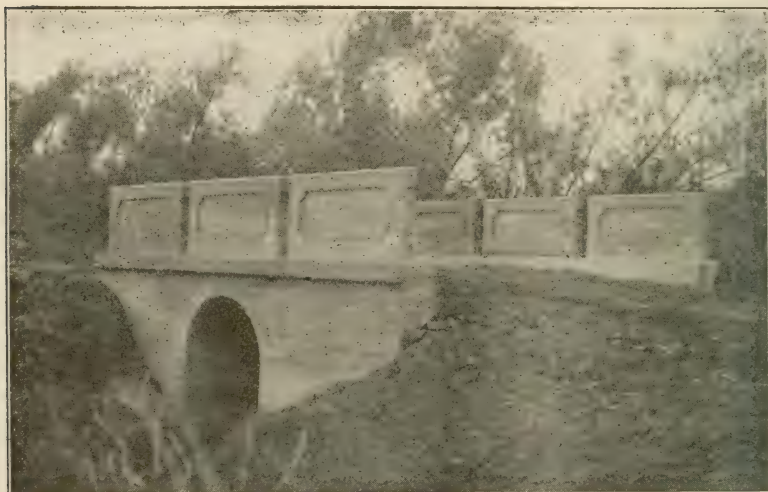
Reinforced Concrete Arch Culvert, Greene County, Iowa, Span Five Feet.
